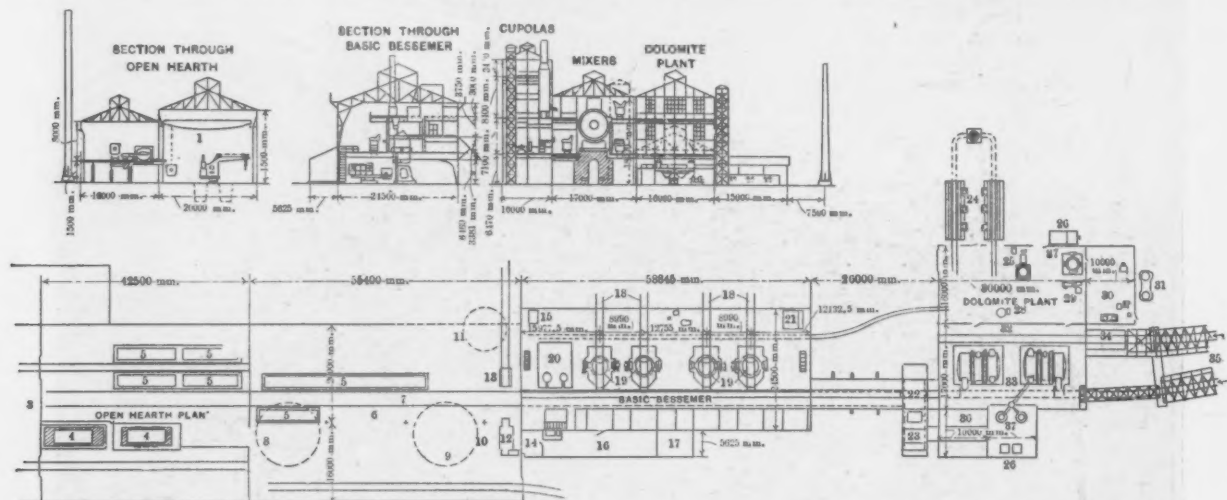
Steel Plant with Mixer and Dolomite Plant.—1, 50-Ton Traveling Crane; 2, 5-Ton Traveling Crane; 3, Extension of Open Hearth Plant; 4, 25-Ton Open Hearth Furnaces; 5, Casting Pits; 6, Cast House; 7, Casting Pit Track; 8, 8-Ton Crane; 9, Ladle Repair; 10, 12-Ton Crane; 11, 2-Ton Crane; 12, Stopper Drying Oven; 13, Slag Lifting Table; 14, Motor Room; 15, 25-Ton Elevator; 16, Repair Shop; 17, Pulpit; 18, Cinder Track; 19, 25-Ton Converter; 20, Spiegel Furnace; 21, 10-Ton Elevator; 22, Scale; 23, Pouring Platform; 24, Bottom Oven; 25, Bottom Stamping Machine; 26, Elevator; 27, Chill Mill; 28, Brick Press; 29, Mixing Machine; 30, Machinery Room; 31, Tar Boiler; 32, Mixer Plant; 33, 500-Ton Mixer; 34, Ladle Elevator; 35, Elevated Track from Blast Furnaces; 36, Ladle Car House; 37, Cupolas.
